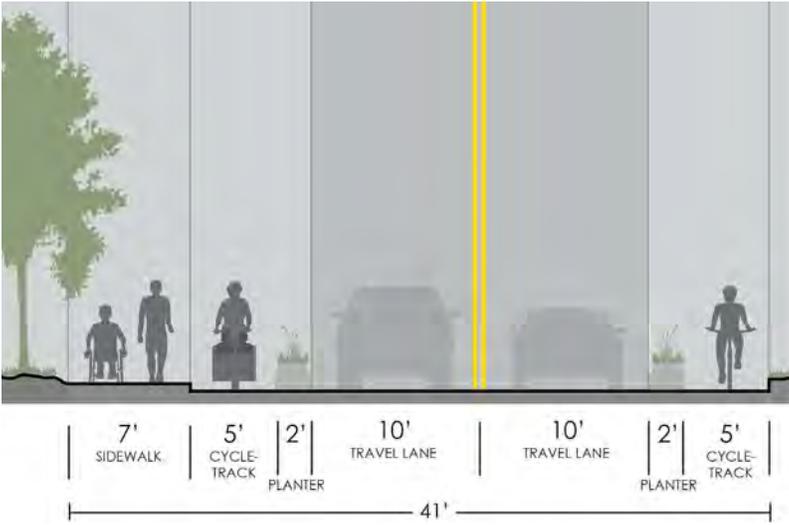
Section G -- Proposed: Roadway design on Eden Avenue, shown at the most constricted location under the railroad bridge.
